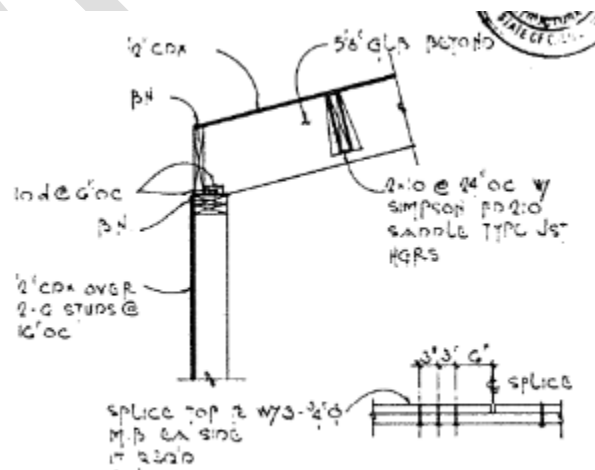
Diaphragm Attachment to Shear Wall Through Blocking
